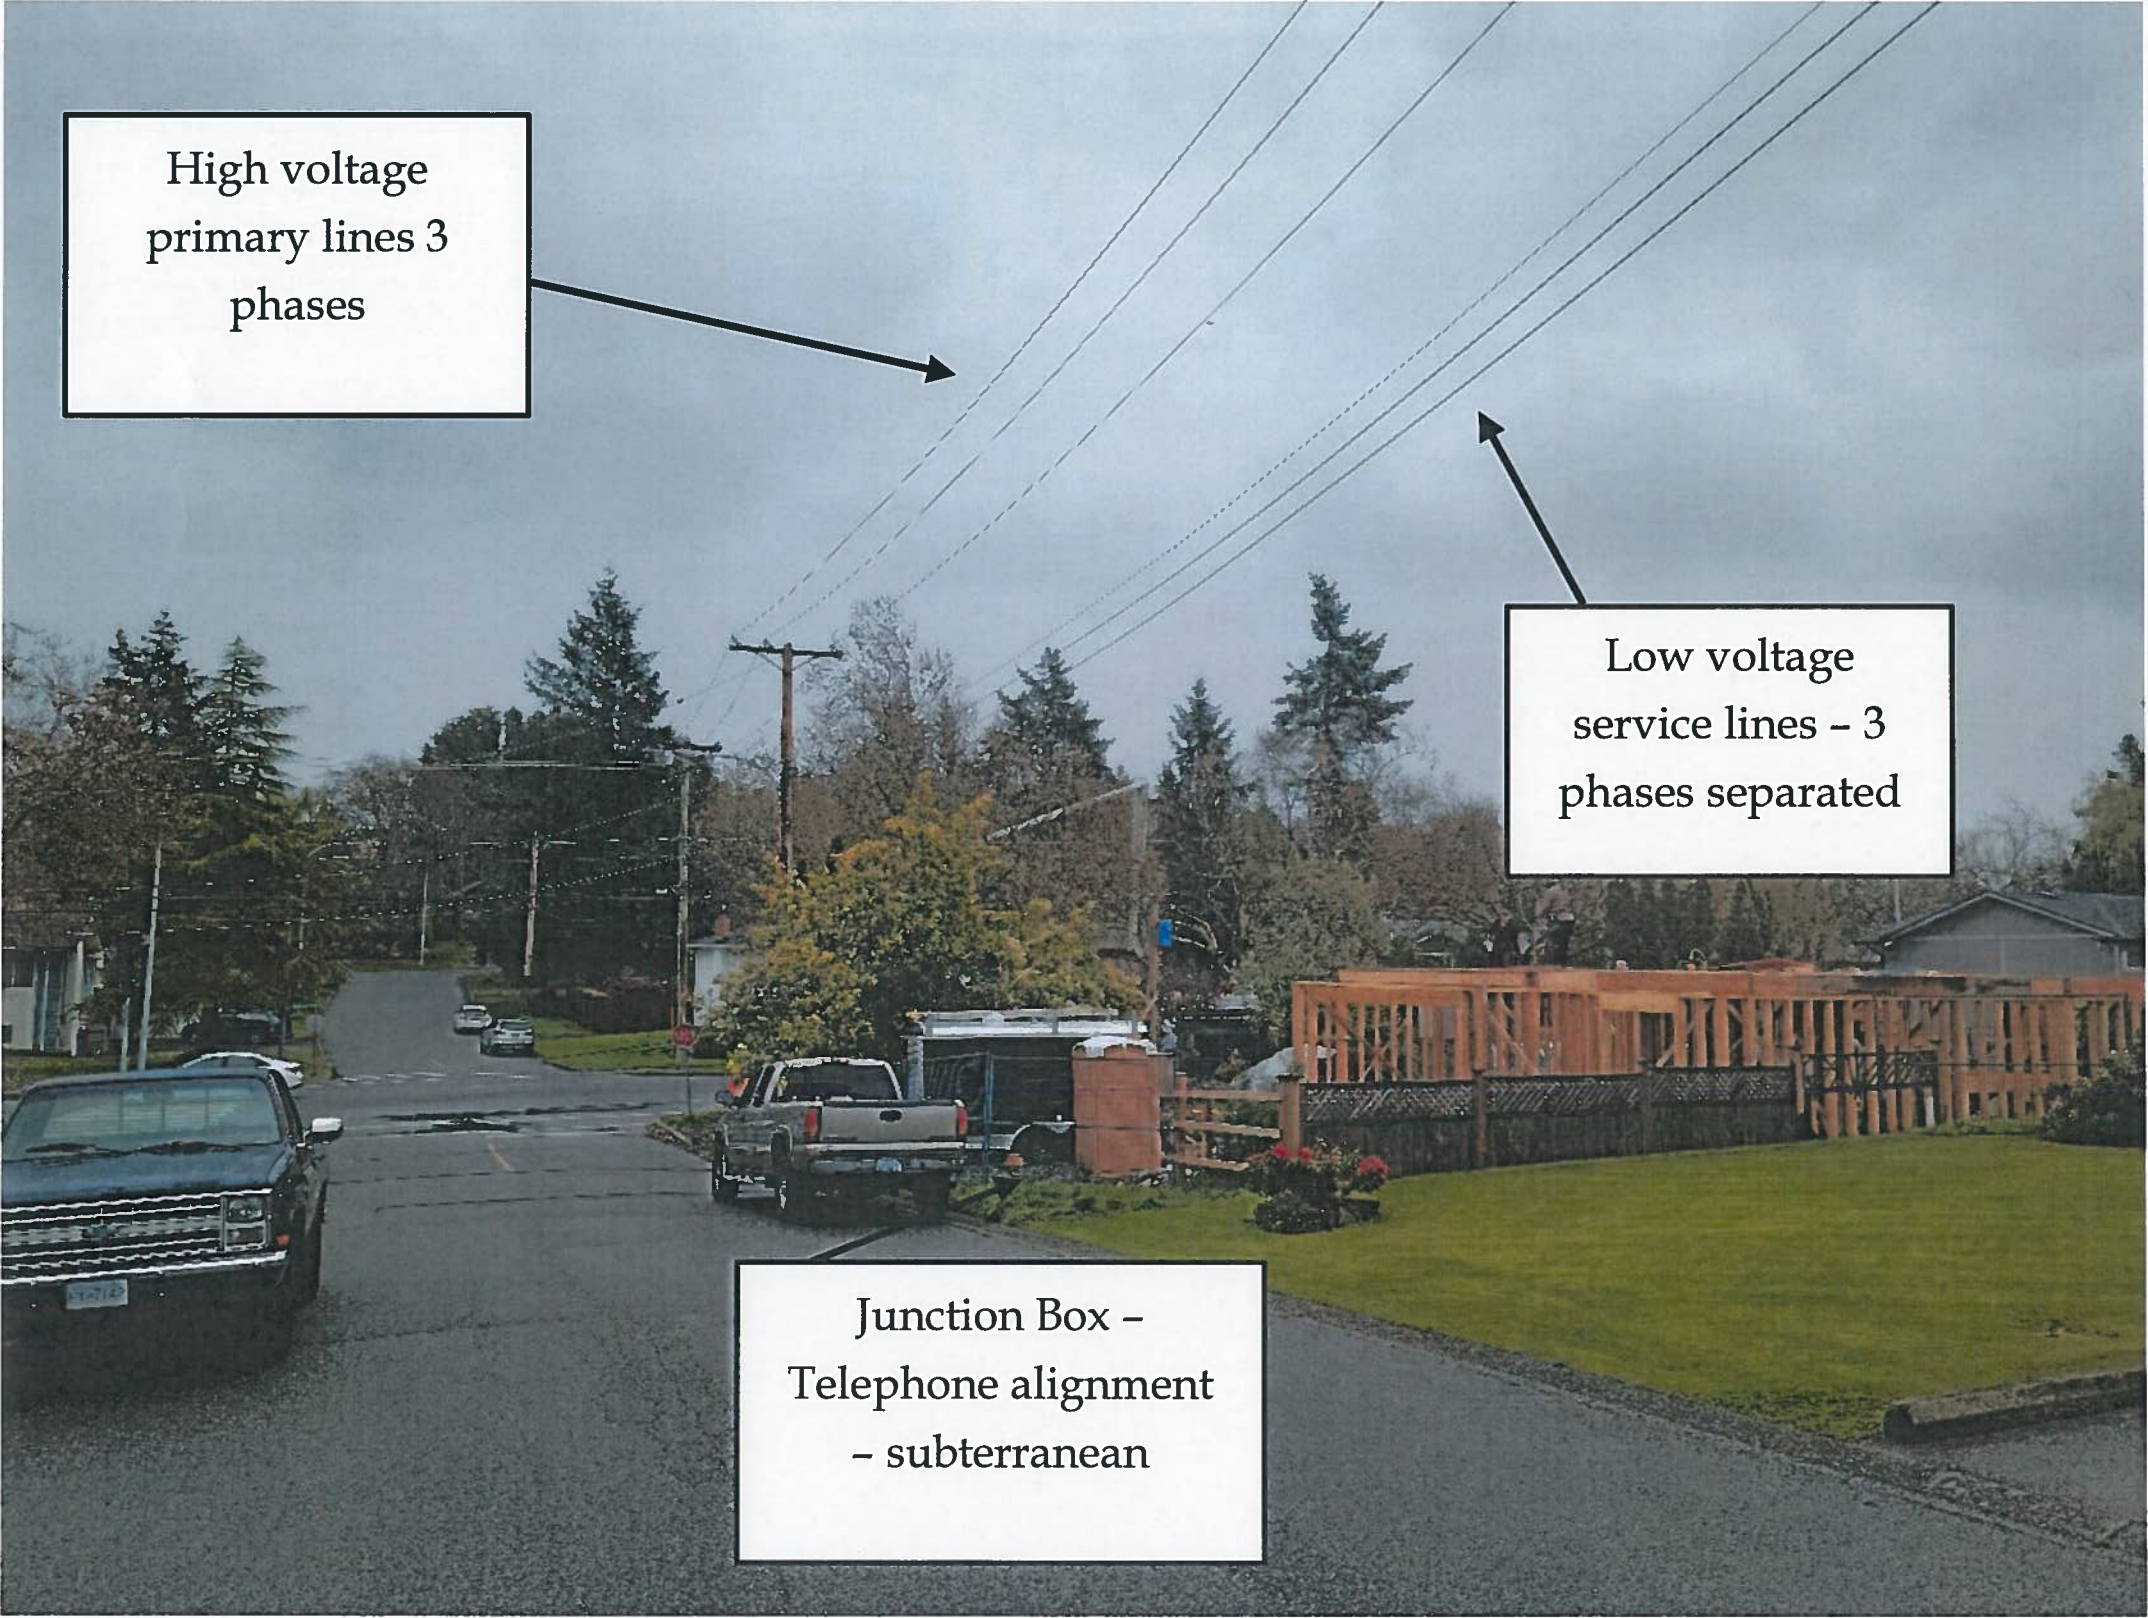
Lot ‘B’ – Existing Boulevard Area – Overhead Electrical – Lot “B”
